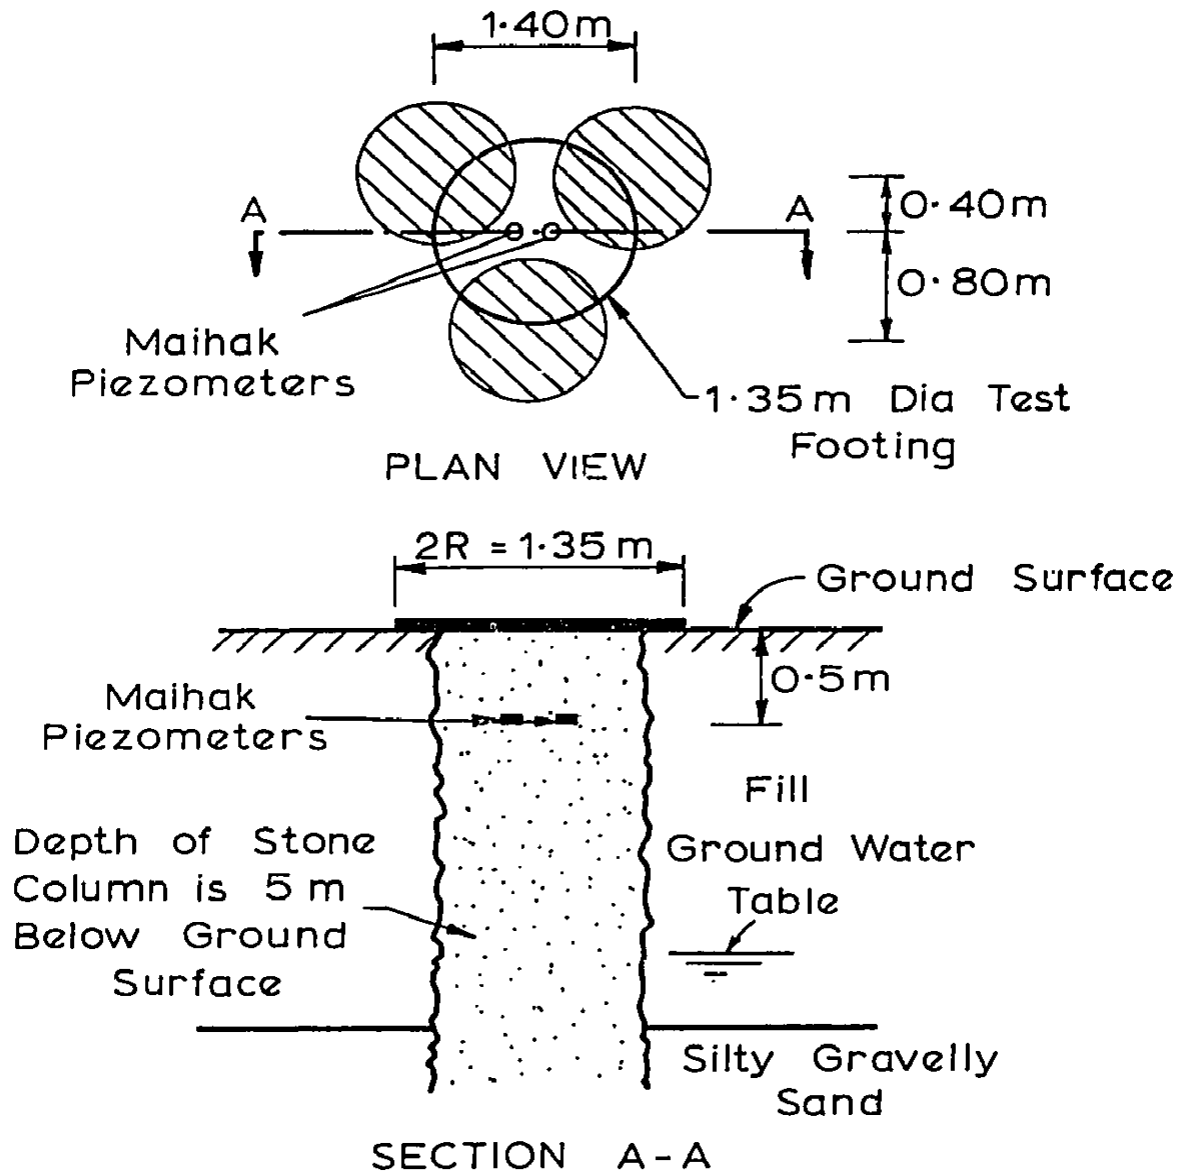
LAYOUT OF FOOTING LOAD TEST
